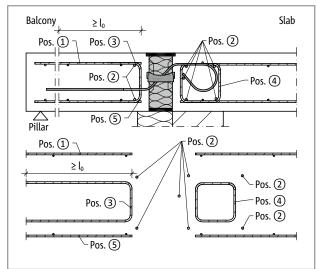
Schöck Isokorb® T type Q-E-V: On-site reinforcement
